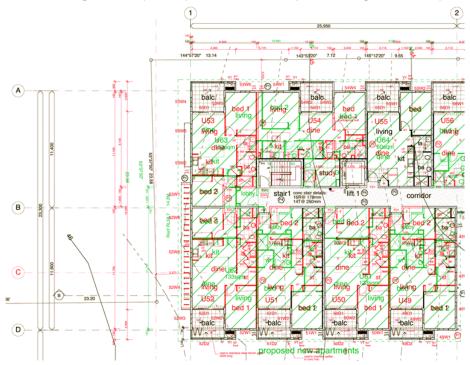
L5 / L6 FLOOR PLAN OVERLAID
